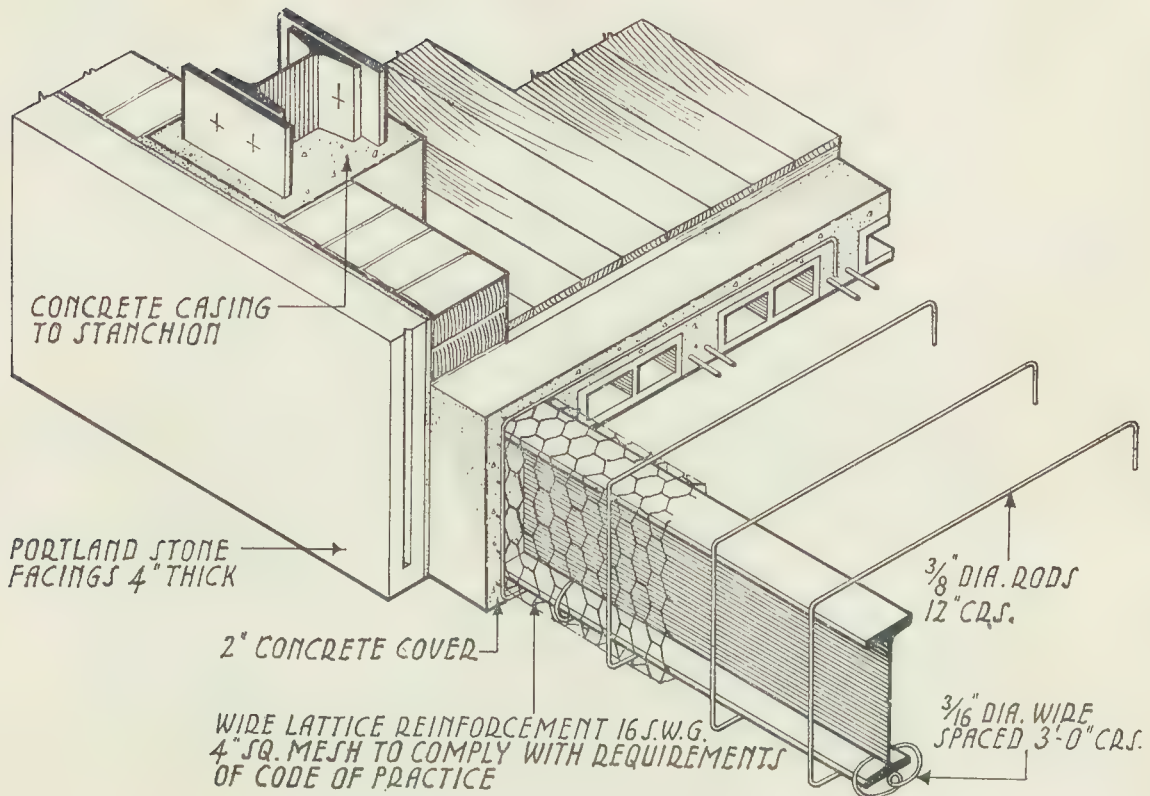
ENCASING STEEL BEAMS IN CONCRETE
